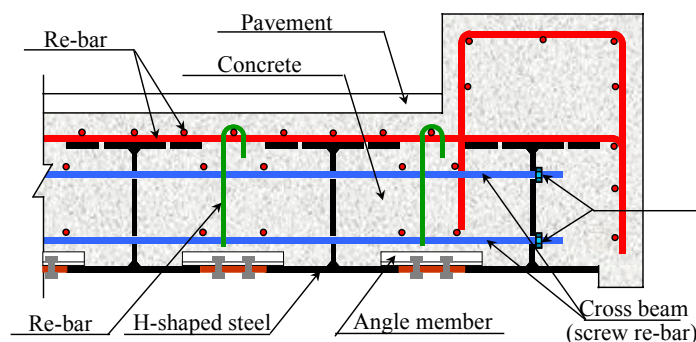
Reinforced concrete slab bridge with H-shaped steels
